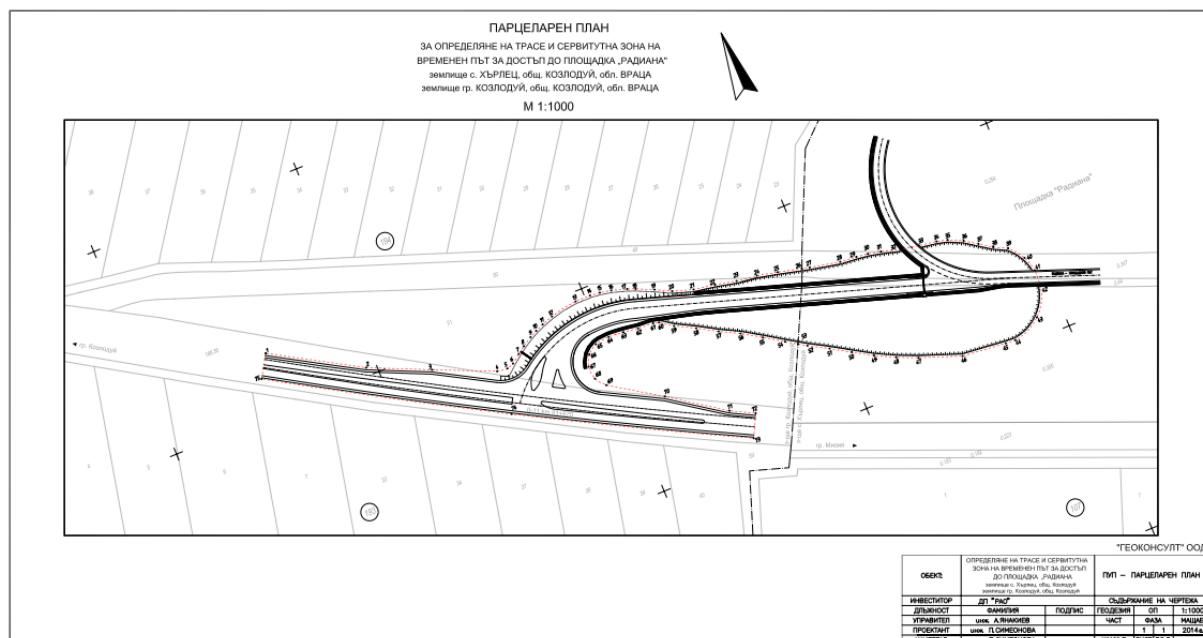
DETAILED DEVELOPMENT PLAN OF ACCESS ROAD TO SITE “RADIANA”
